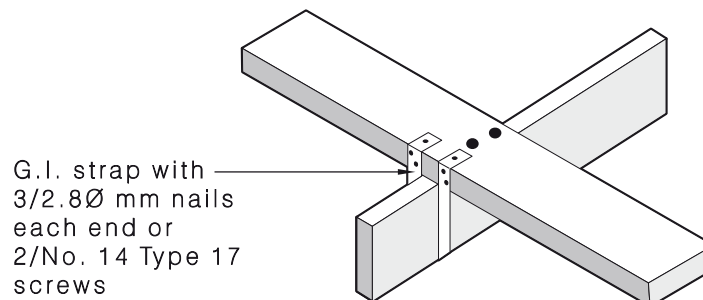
TYPICAL CONNECTION FOR TYPE B BRACING UNITS—
